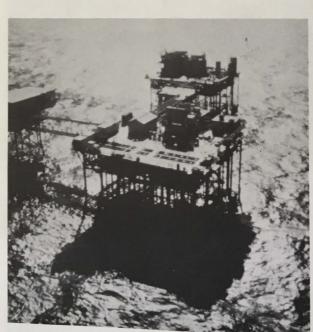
Drilling systems illustrated in previous figures and photographs are mobile exploratory drilling systems. After a discovery has been made, permanent systems must be set in place. In the Gulf of Mexico, the steel jackets are set on the sea floor and anchored with piling. Production and drilling facilities are placed on top of the steel jacket.
